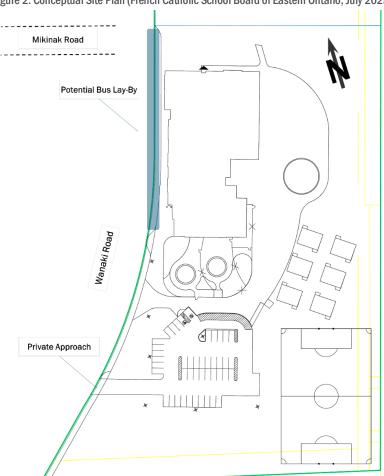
Conceptual Site Plan (French Catholic School Board of Eastern Ontario, July 2025)
